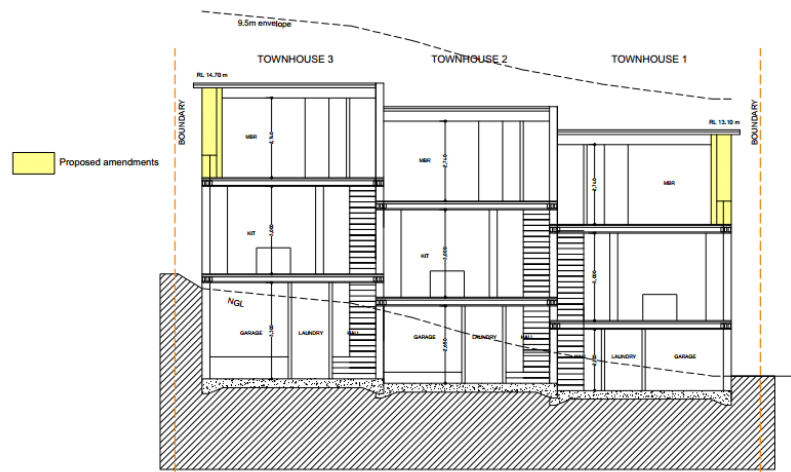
Section Plan showing locations of amendments to original design (Upper level side boundary setbacks)
